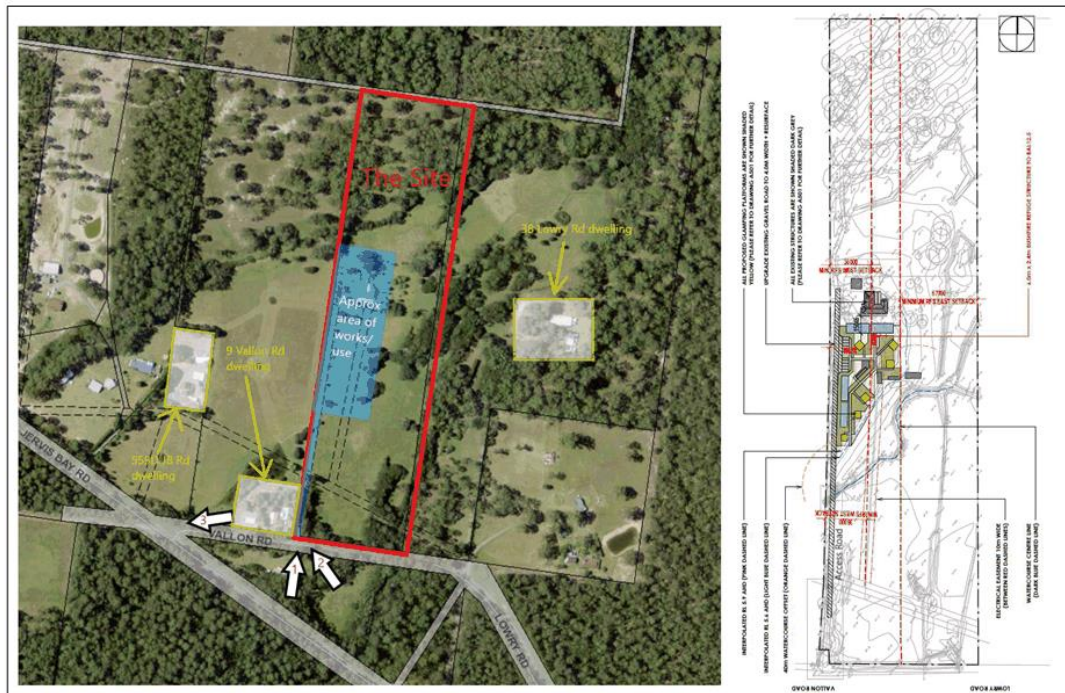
Aerial photograph of site with Site Plan indicating location of works, direction of photographs (Figures 5-8) and location of neighbouring dwellings
